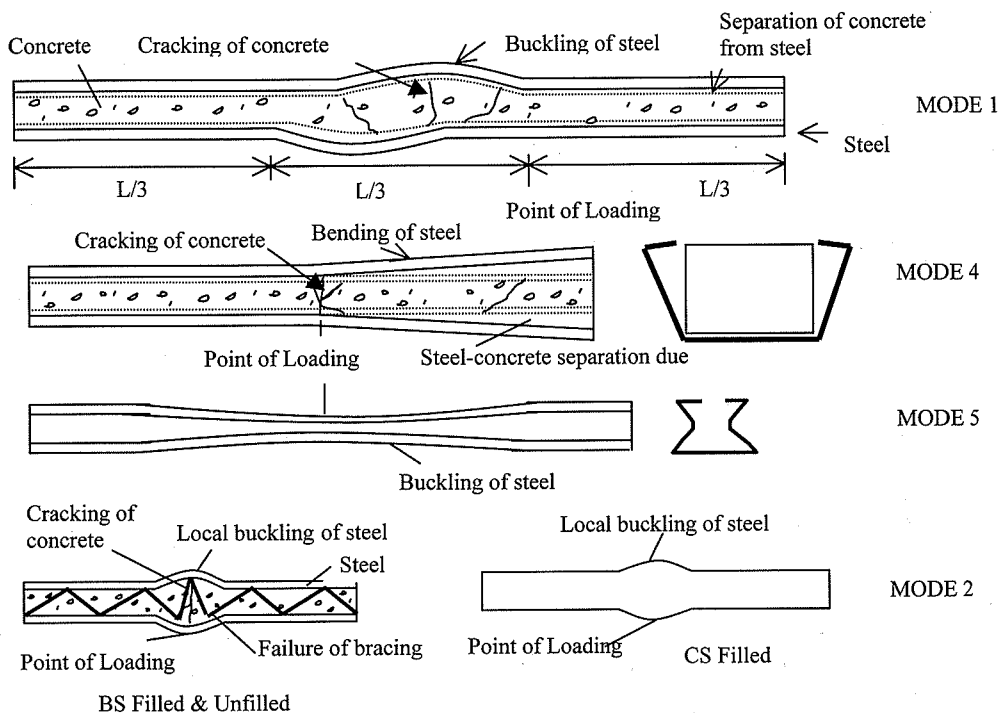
Failure modes 1, 2, 4 & 5 of TWC beams (Series A & B)
